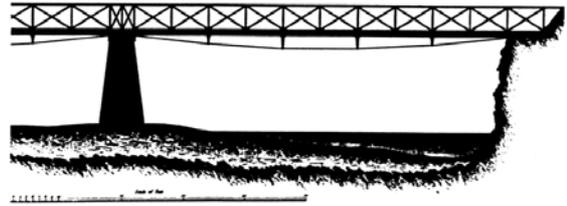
Wrought-iron underspanned timber footbridge over the Whitadder at St. Albans, Rathans, Robert Stevenson, c.1830s. (Sutherland²)
